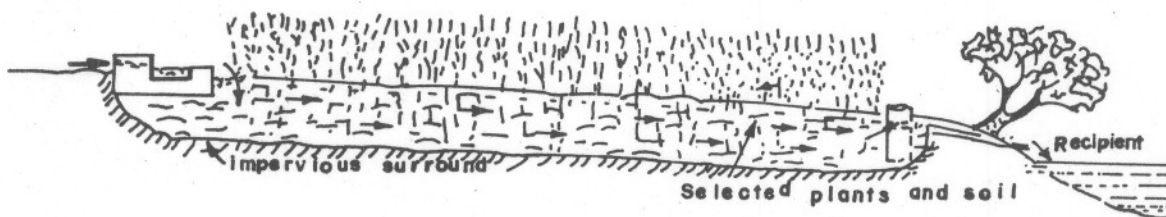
PERSPECTIVE AND SECTION OF TYPICAL ROOT ZONE INSTALLATION
